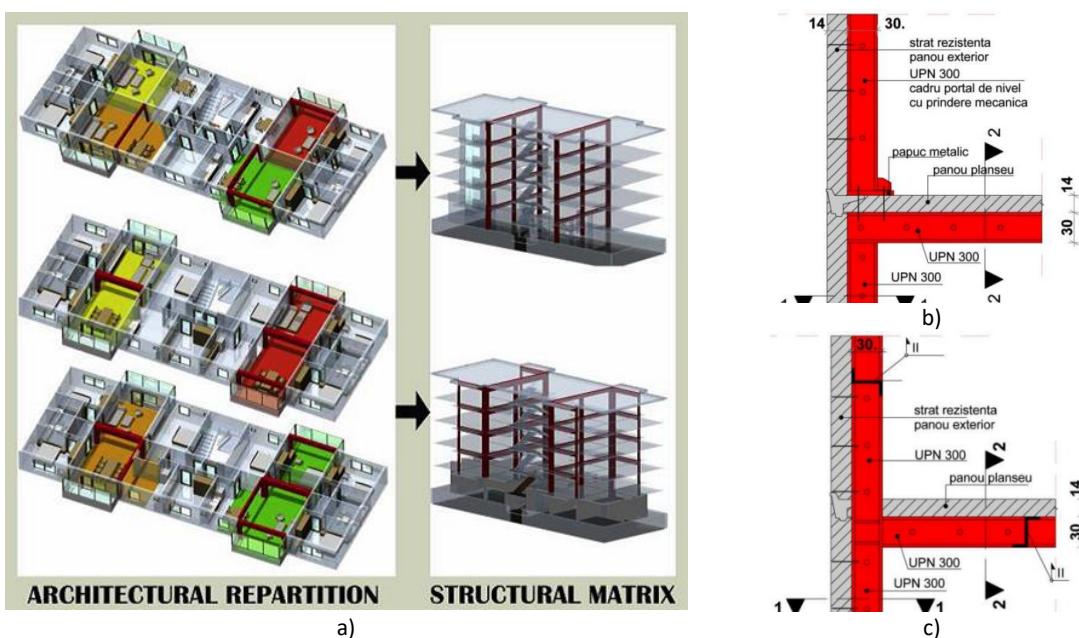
Scheme of proposed intervention: a) repartitioning of the floor and structural matrix; b) floor steel frame insertion; c) vertically continuous steel frame columns insertion (Botici et al., 2012).
